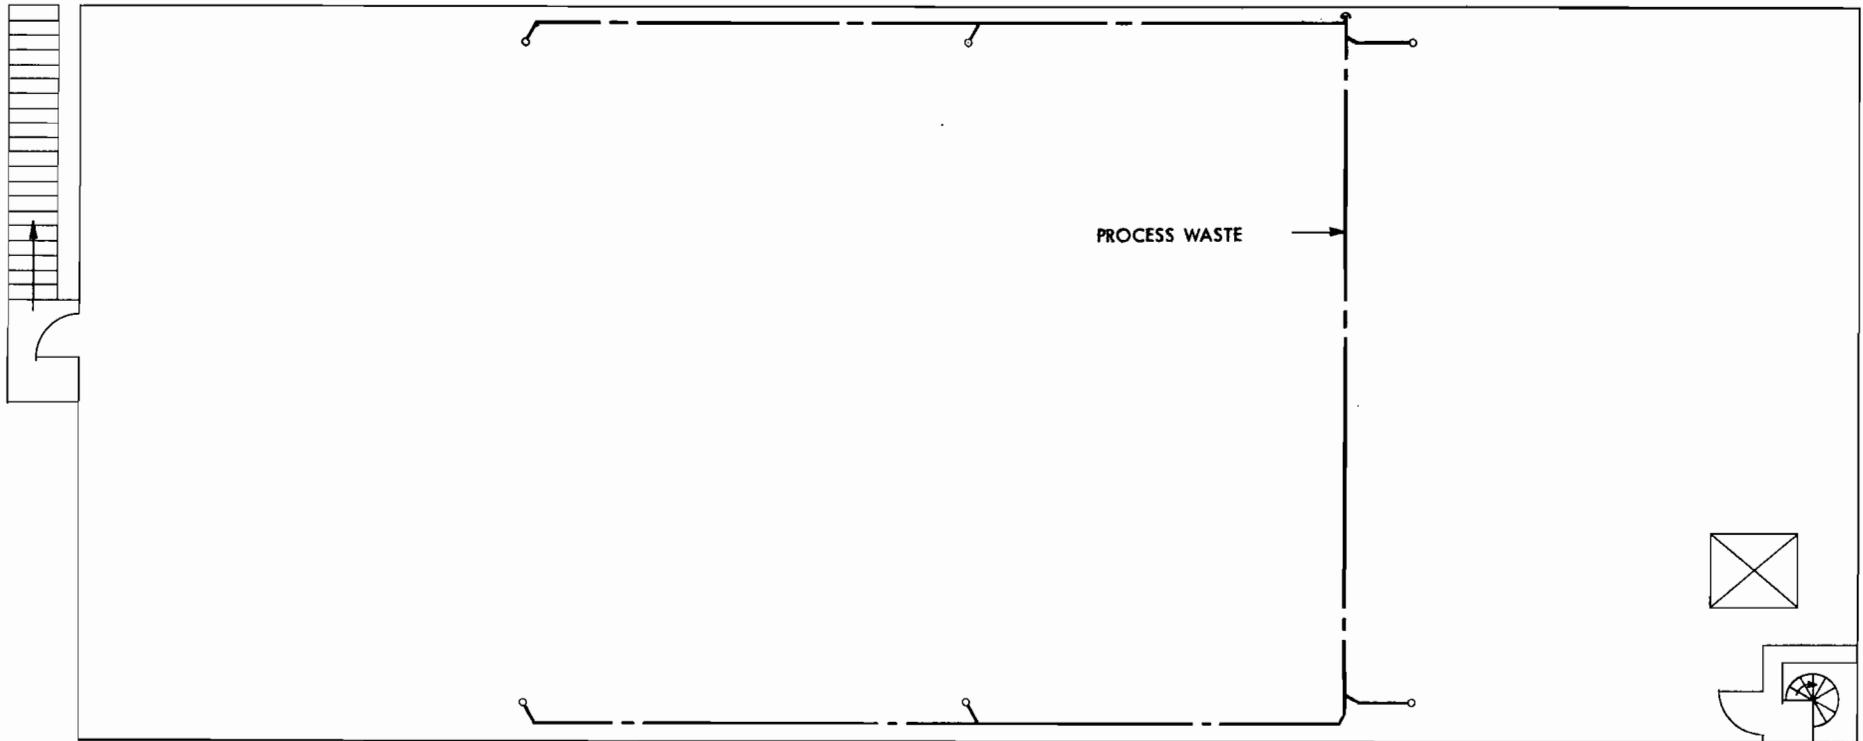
BUILDING 3508 FIRST FLOOR PLAN
